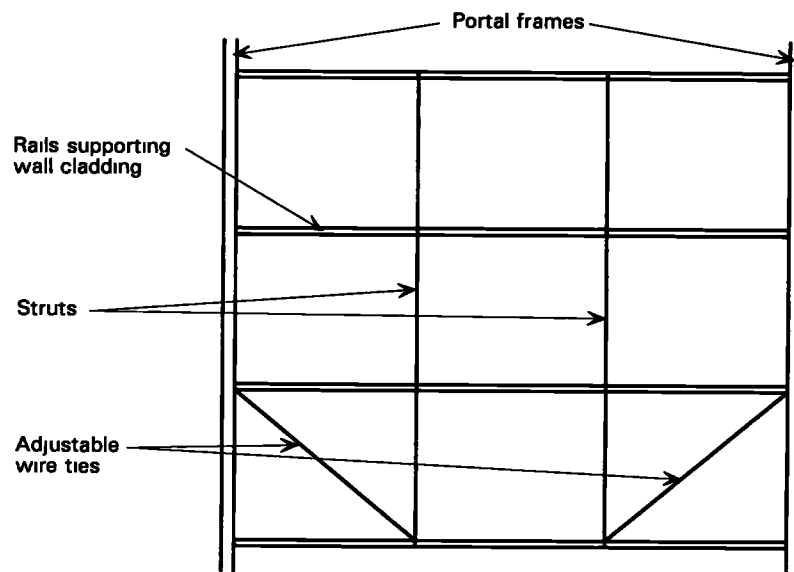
Typical arrangement of wall sheeting rails and supports
